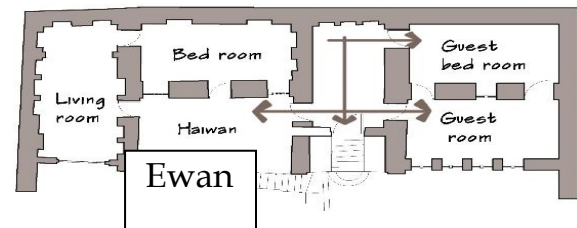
First floor plan of vernacular houses in Sulaimany showing Iwan .
